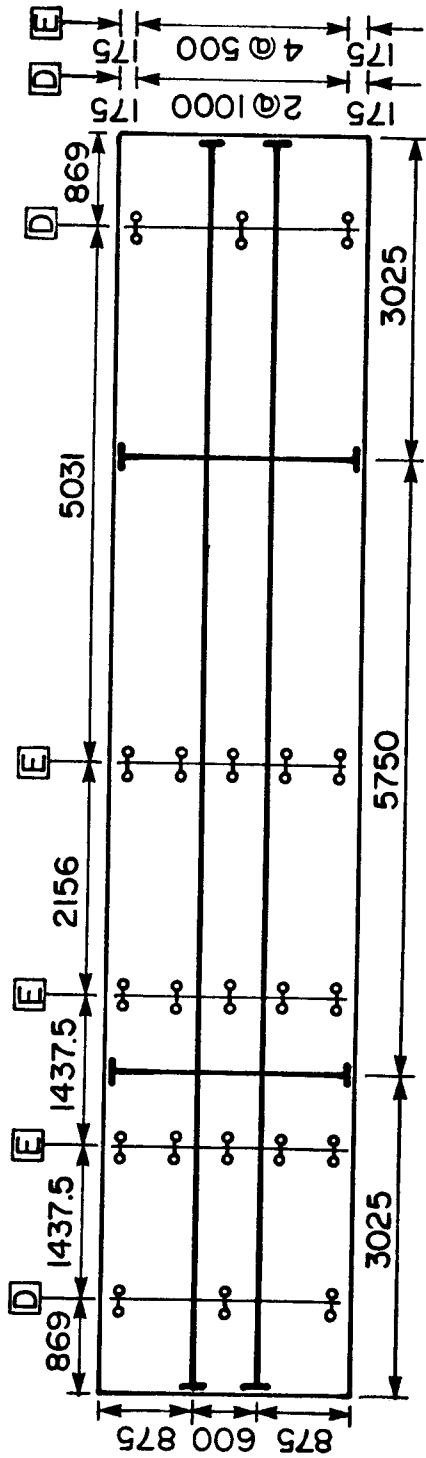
Location of slab instrumentation measuring concrete strains on composite truss 2
